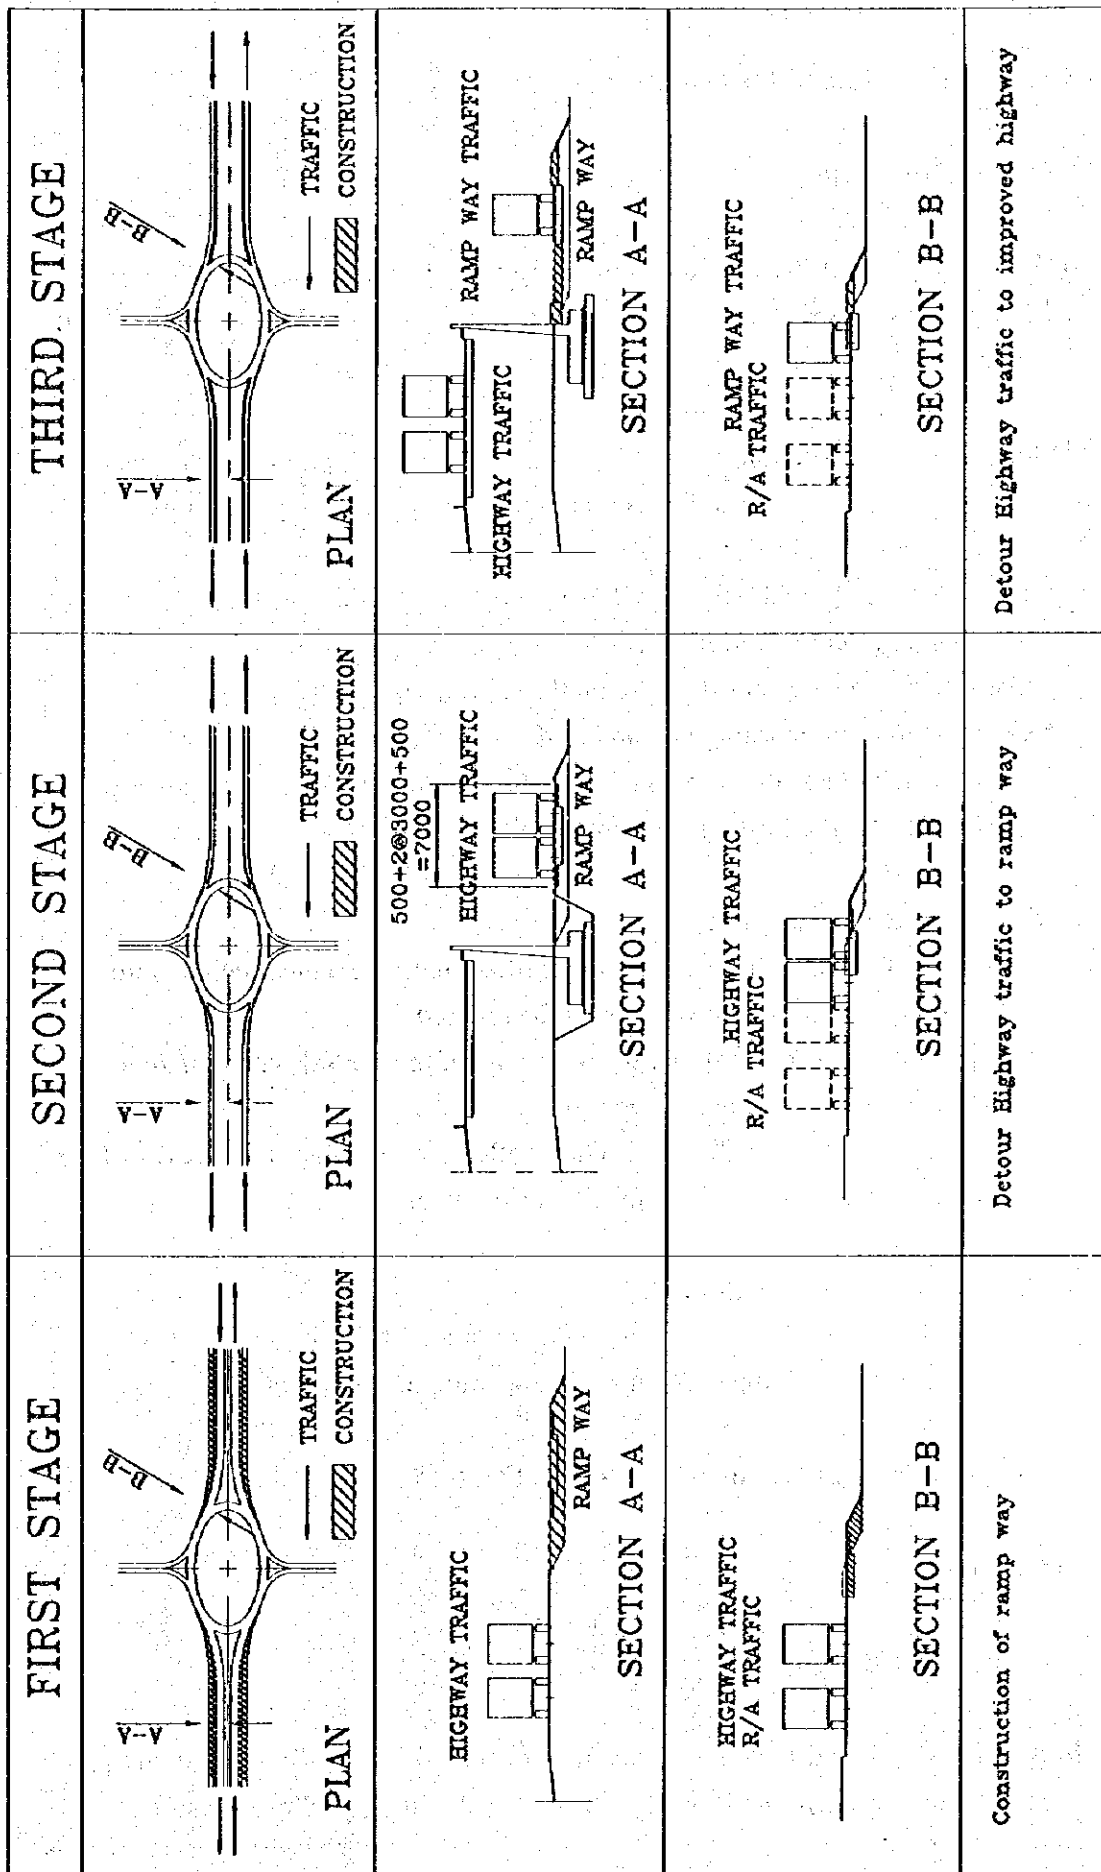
Detour Plan for F/O Construction (with R/A improvement)
